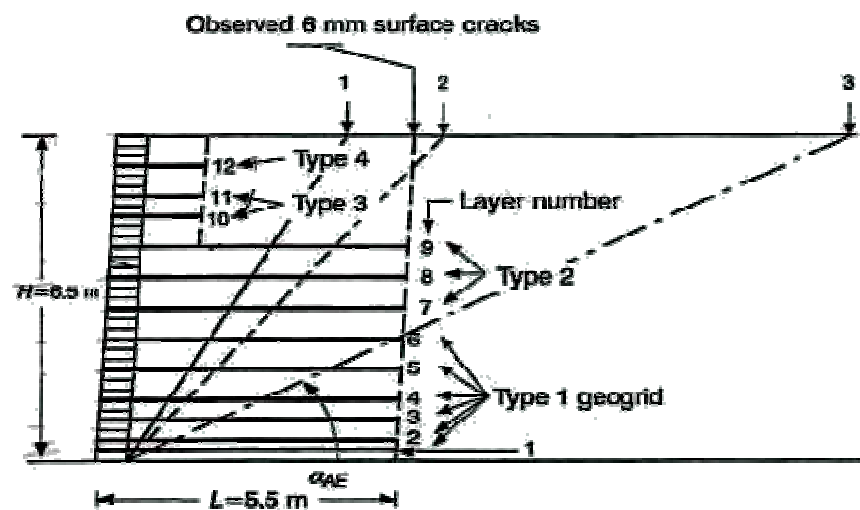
Cross-section view of Valencia Wall showing location and orientation of internal failure planes under static and dynamic loading conditions
